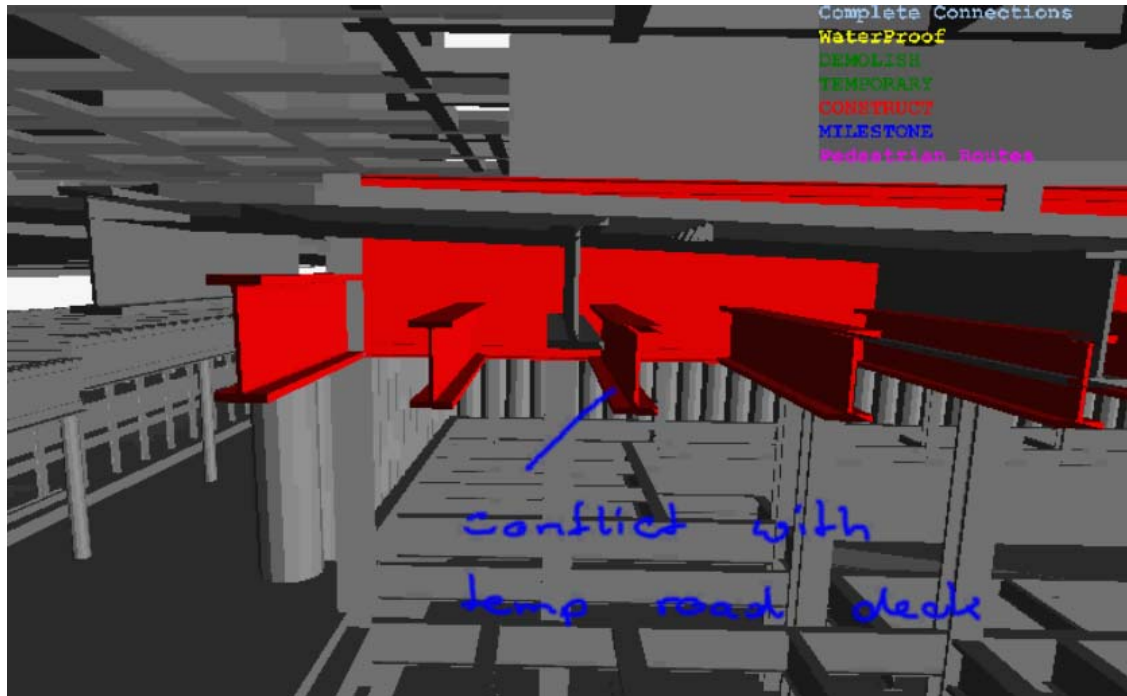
This 4D model supported the CCM team to make decisions about the closure of a road to allow underground construction. Initially, the CCM team planned to install a temporary road deck that would allow maintaining the street traffic while carrying out construction work below. However, using this 4D model, the CCM team realized that there was not enough space to support such a temporary road deck. Therefore, the CCM team made the decision to close this street during construction.
